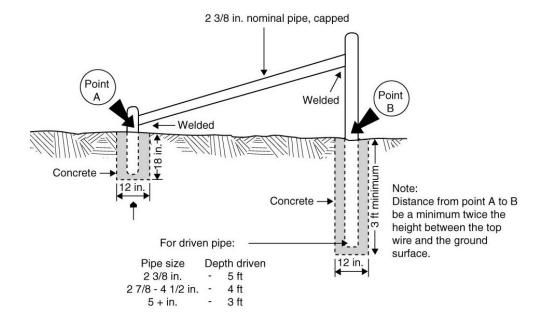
STEEL WELDED SINGLE POST END/CORNER BRACE
